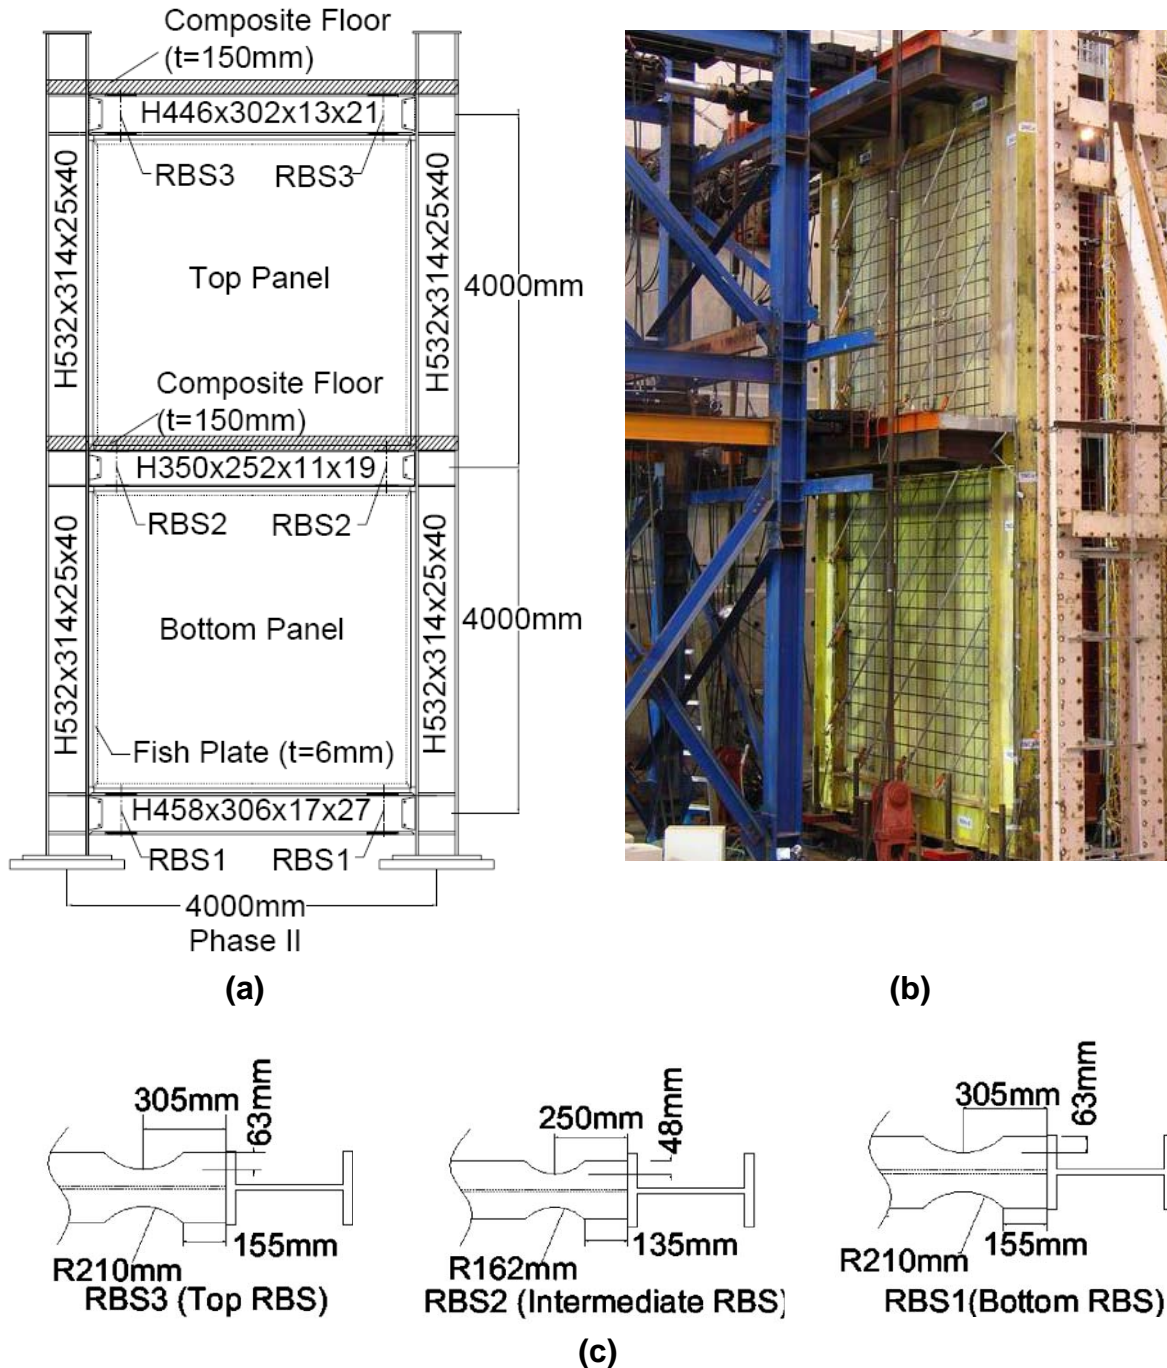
Two-Story SPSW Specimen (Qu and Bruneau 2008):
